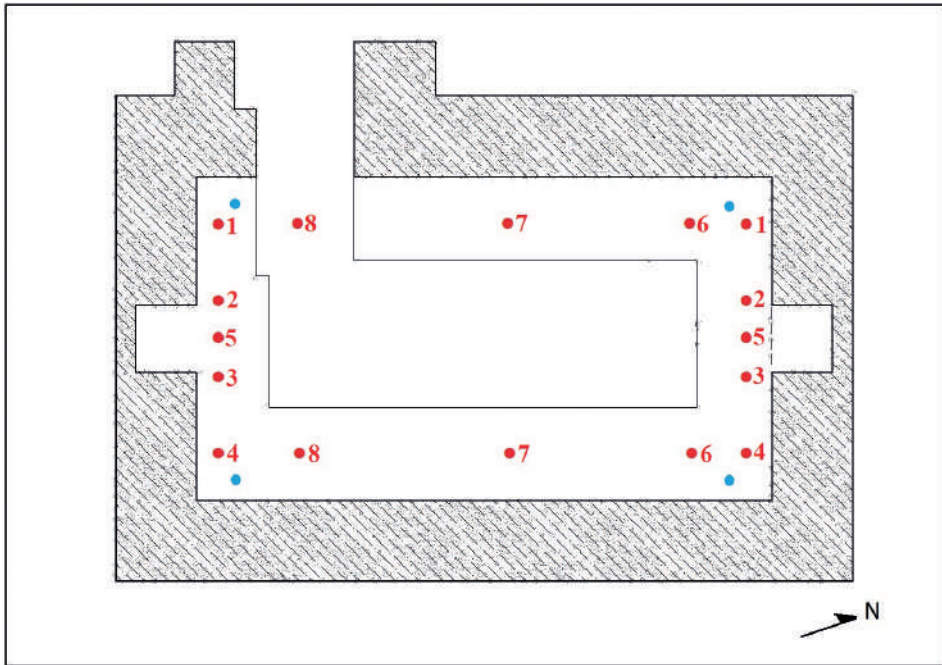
Floor plan of PVT01, in red, the camera positions. The positions of the lights are in blue. Drawing from Karim, Abdul-Karim 2019; elaboration D. Andreucci – MiSAK 2021.
